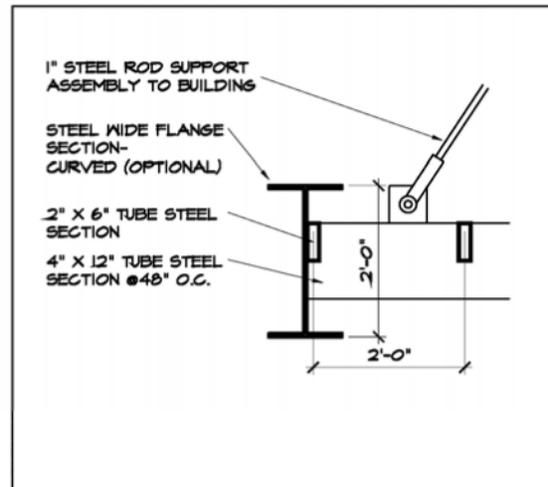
C FREEWAY COMMERCIAL (FC) ARCHITECTURAL DETAILS
